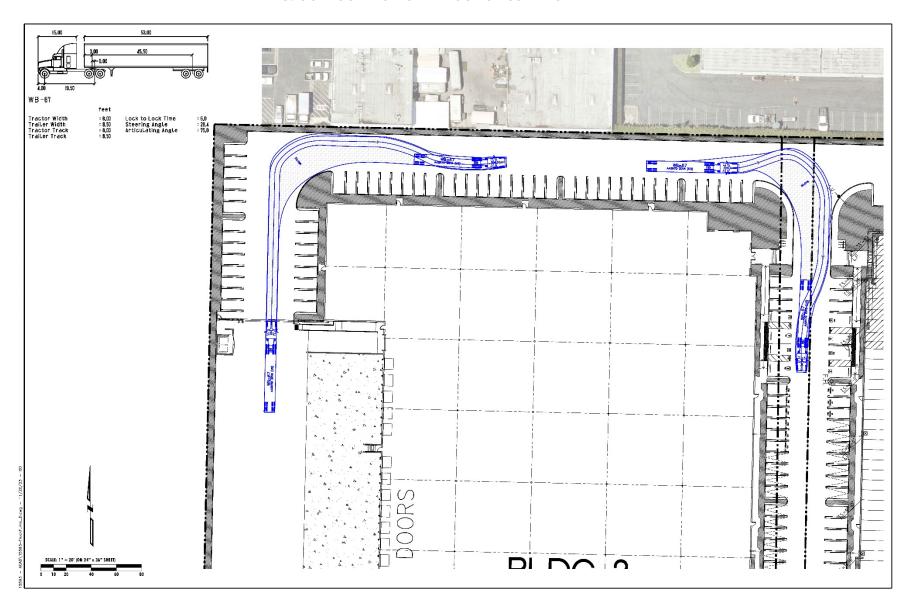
INBOUND ON-SITE TRUCK CIRCULATION VIA DRIVEWAY 2
